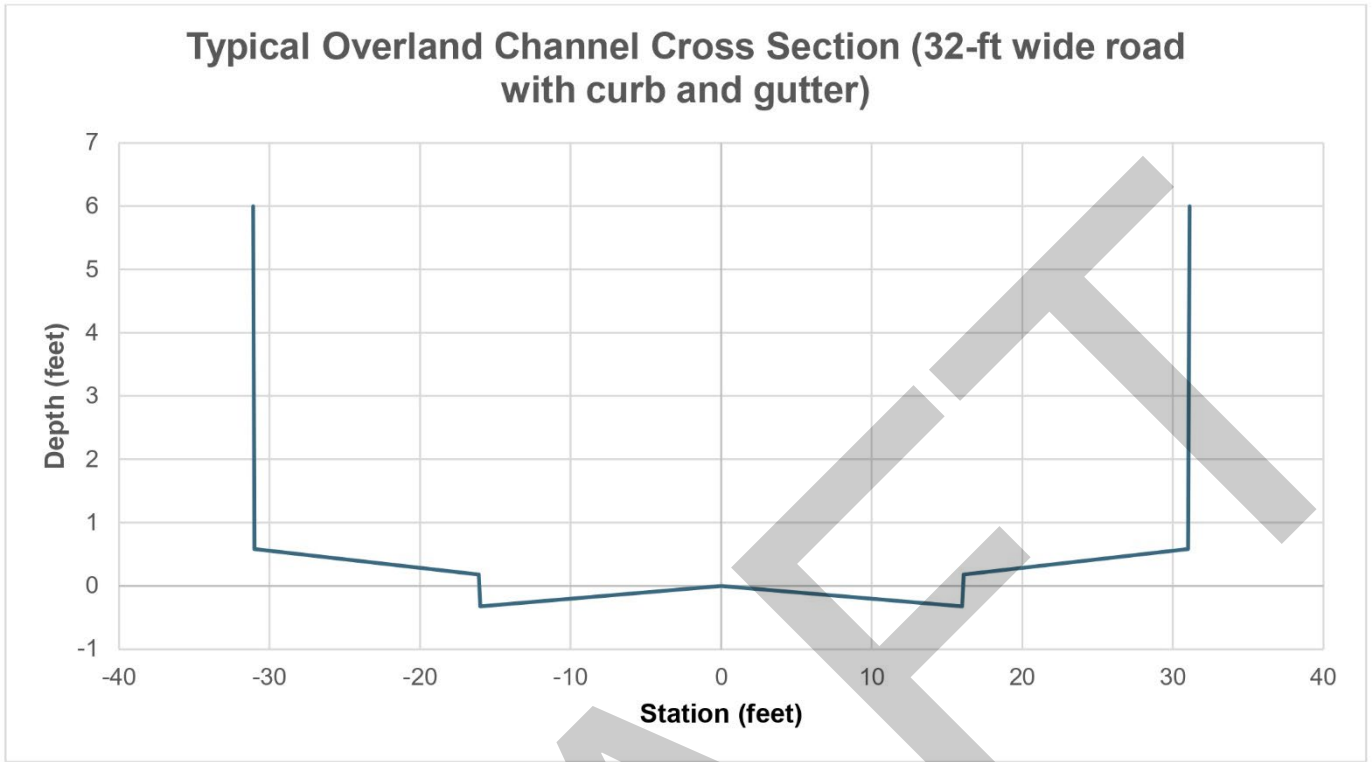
Typical Overland Channel Cross Section (32-ft wide road with curb and gutter)
